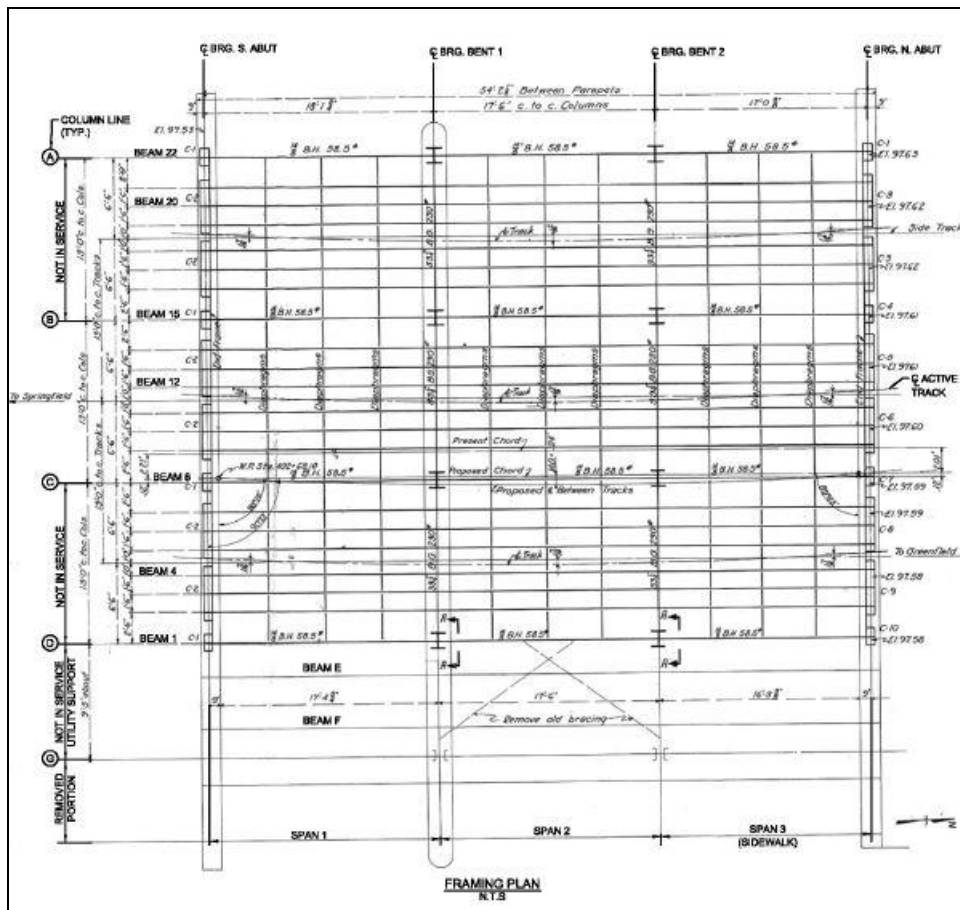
Framing Plan (source: HTNB Bridge Load Rating Report, August 2013).
